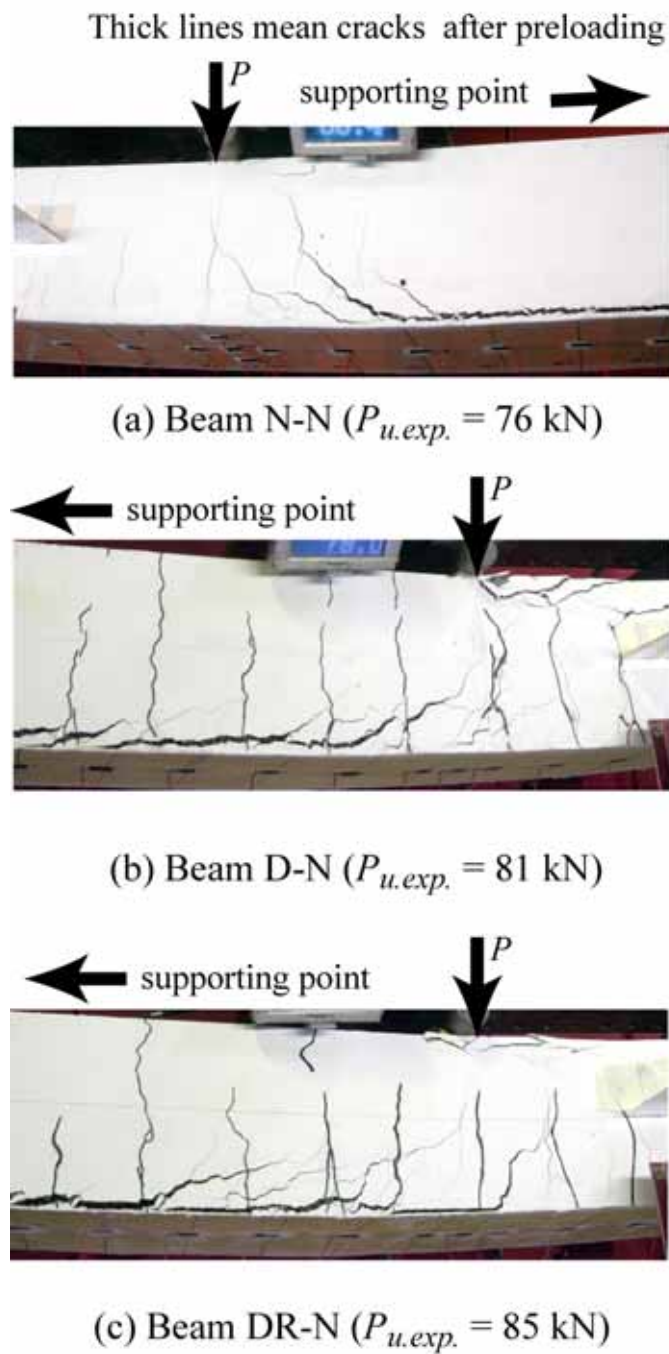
Crack distributions on side-surface of beams reinforced with normal sheet
